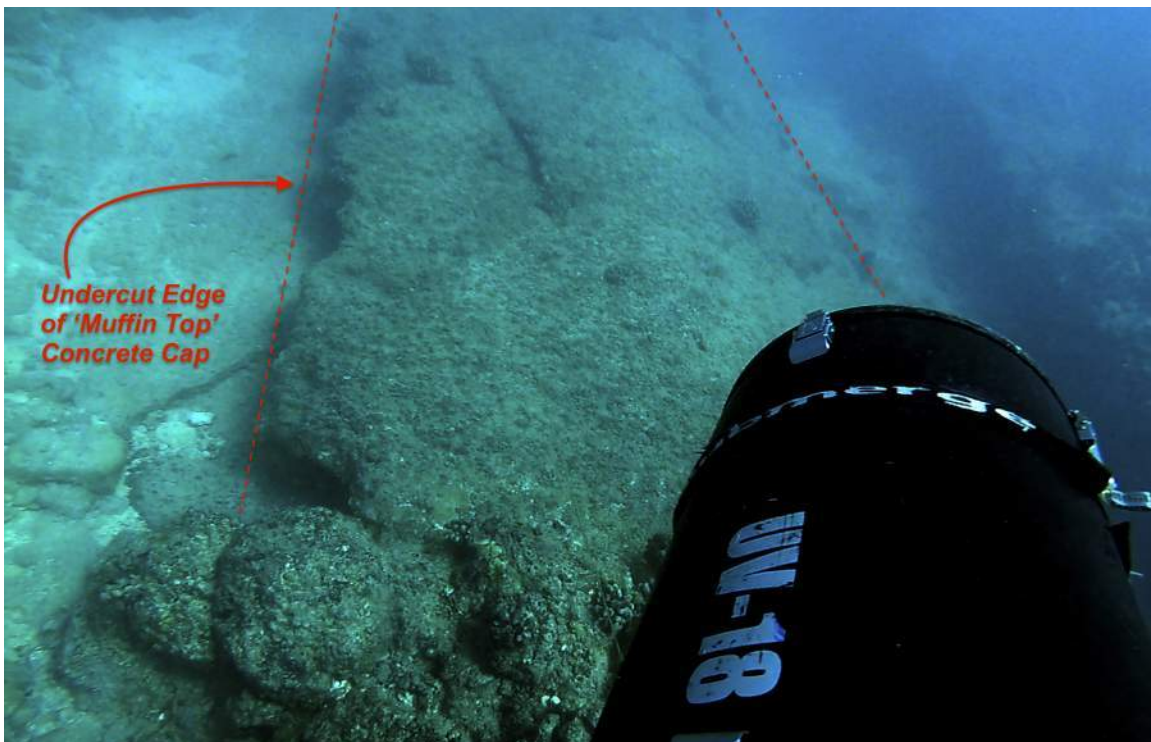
Concrete jacket/cap with edge voids creating a “muffin top” profile
